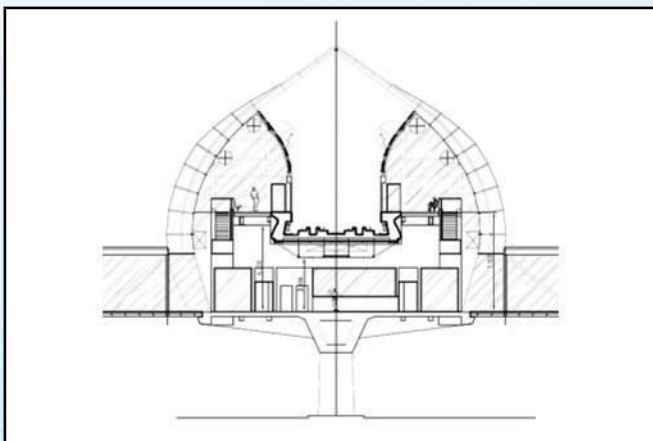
Type 2 elevated (E2) station: elevated concourse
